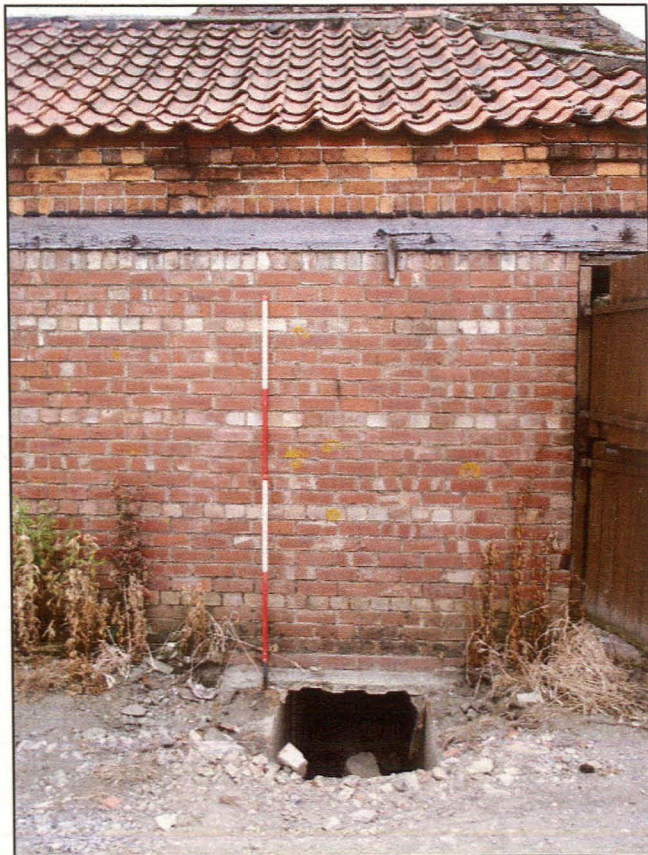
(Shot 72): Exterior shot of the grain-dryer B7 with modern brick work with an English Garden Wall Bond below the wooden beam. Looking west-south-west
